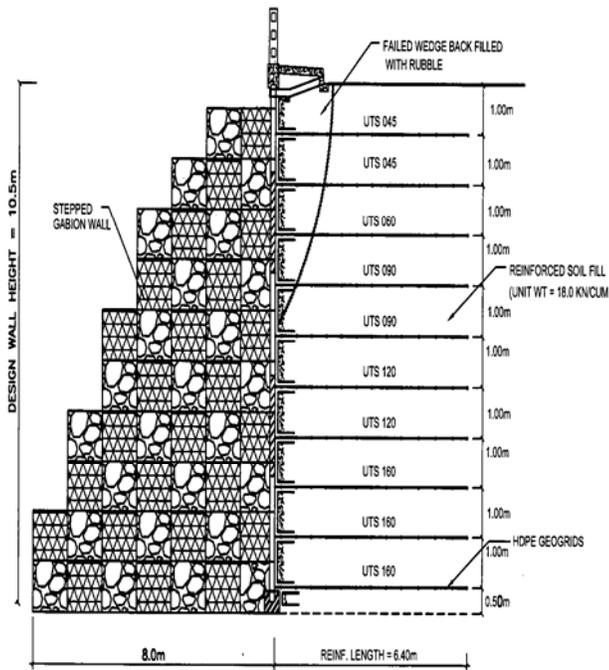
Stepped Gabion Wall Built to Protect the Failed Section
